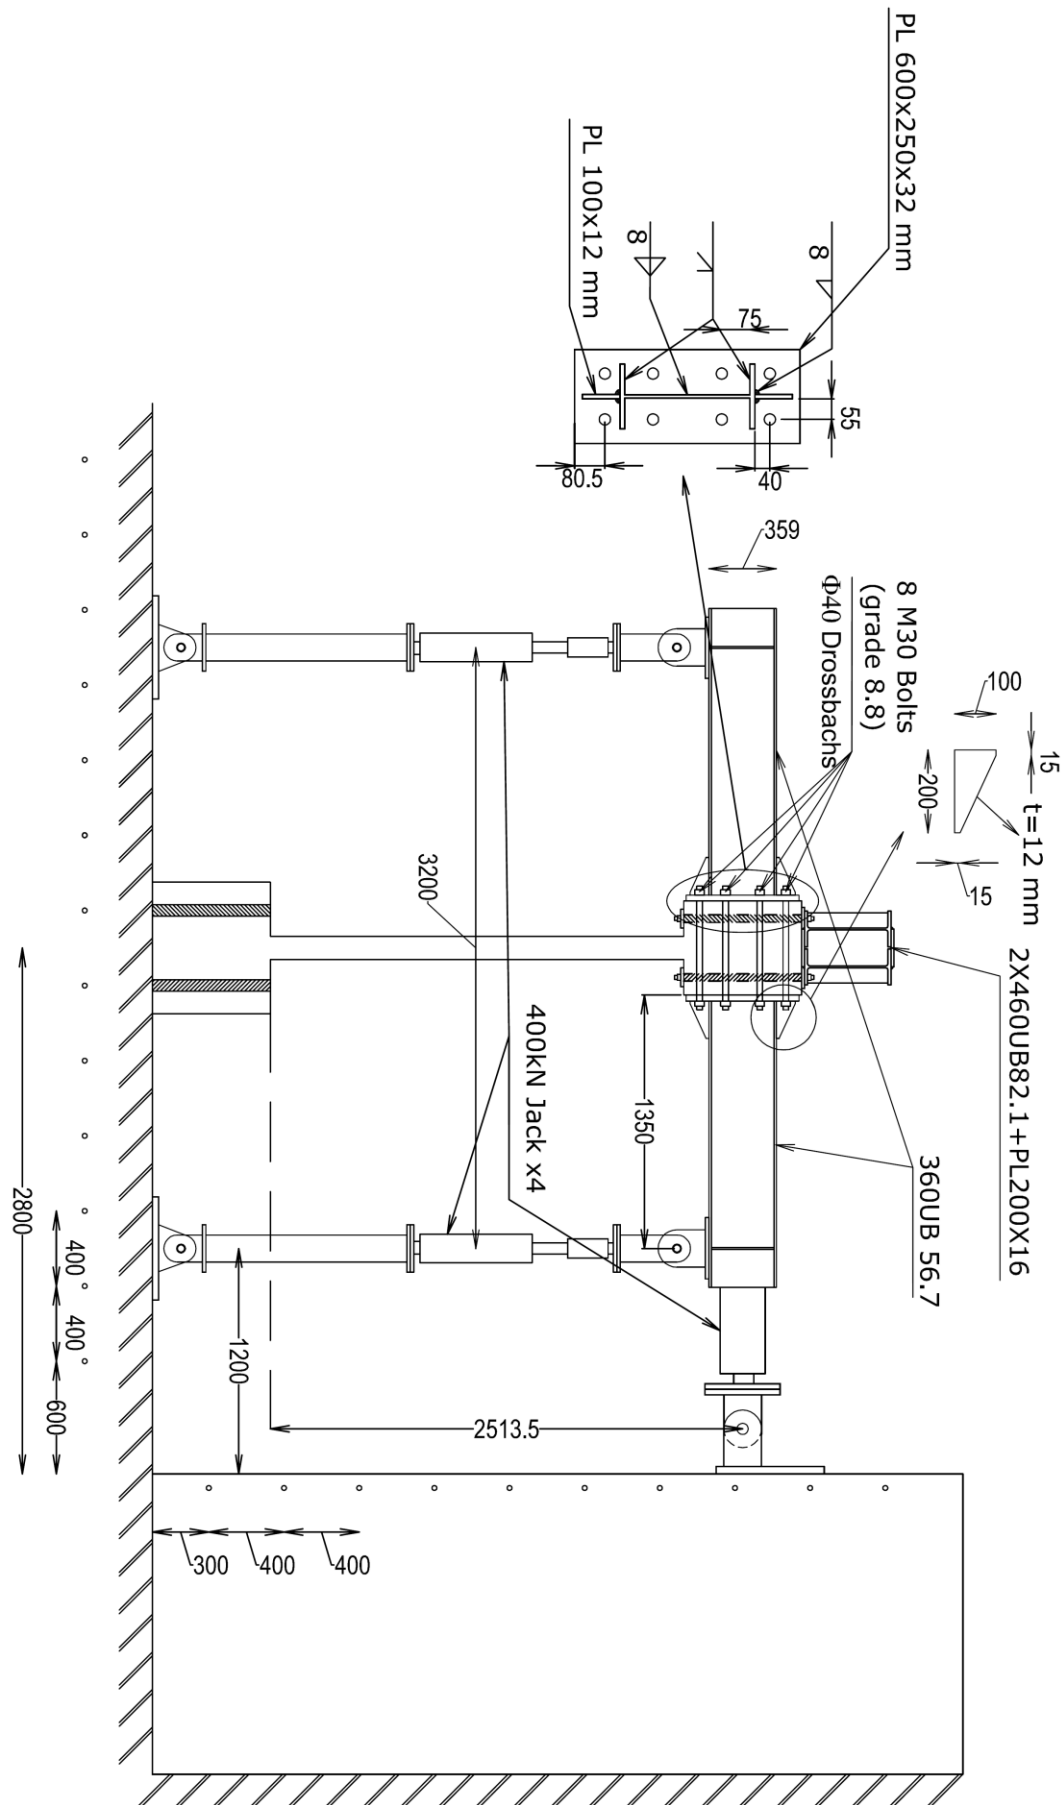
Schematic view of the test setup – out-of-plane view (right/south view)
